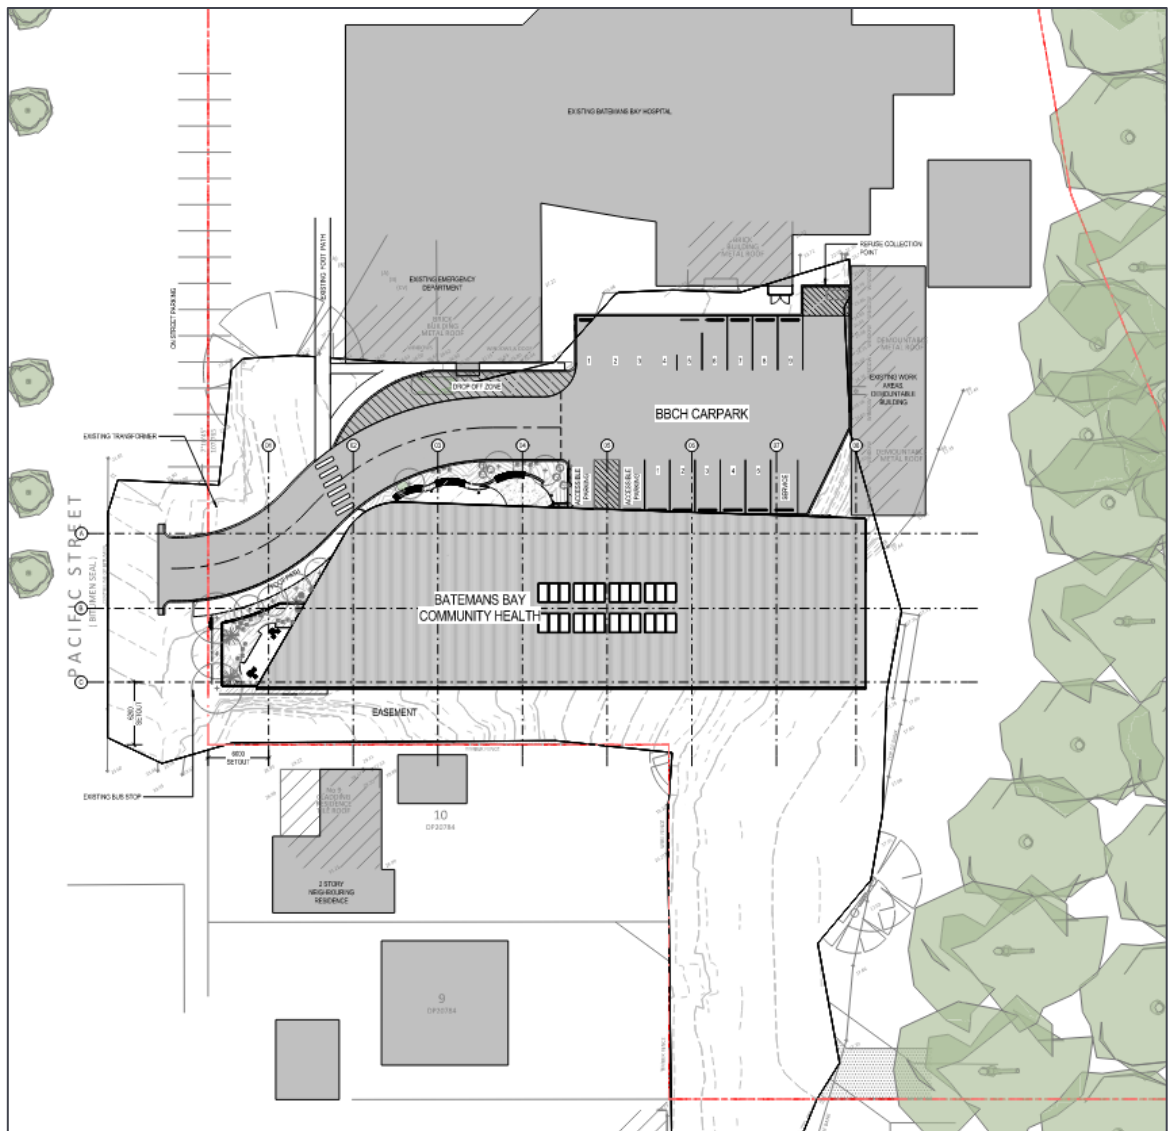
General Ground Floor Arrangement (Source: Architectus)
